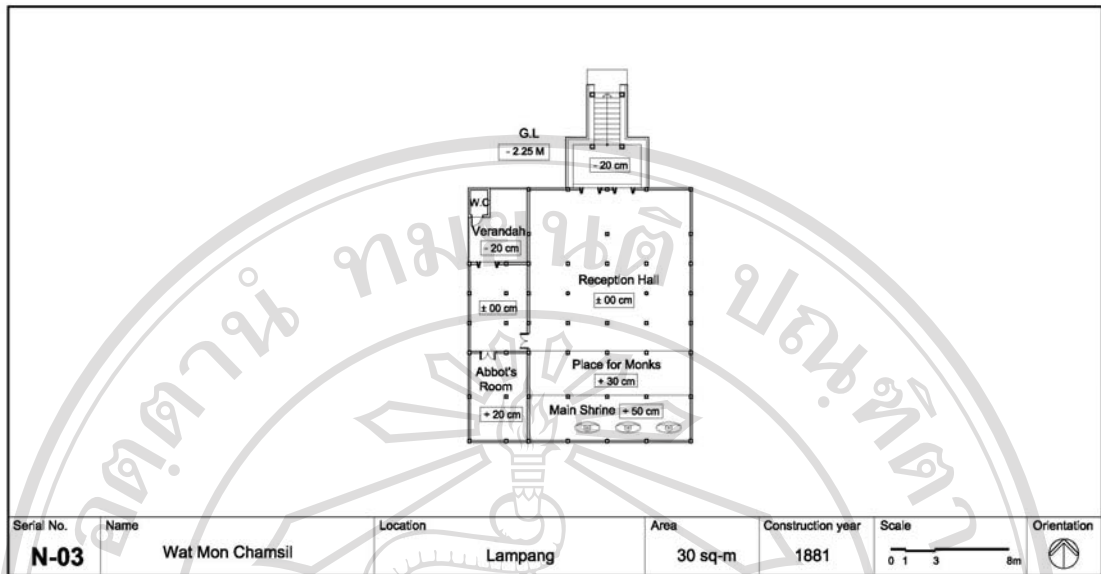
Plan of Wat Mon Chamsil, Lampang
